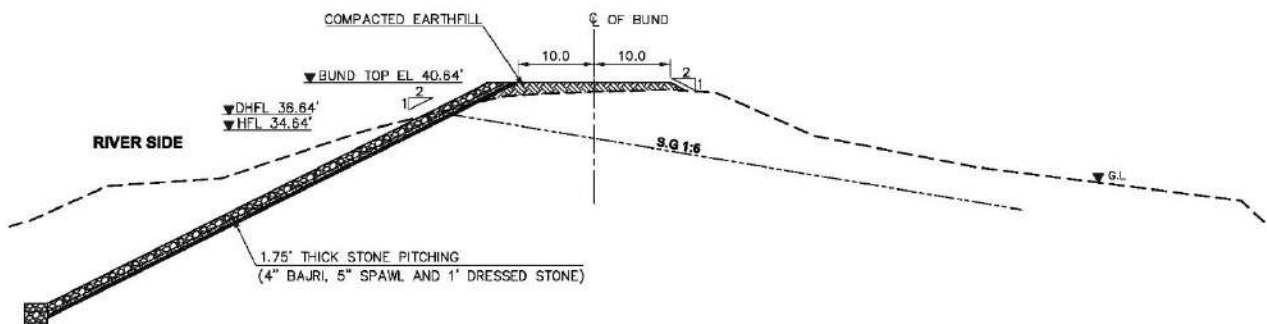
Typical Cross Section of Stone Pitching and Raising of BU Bund at Mile 14/3+220
